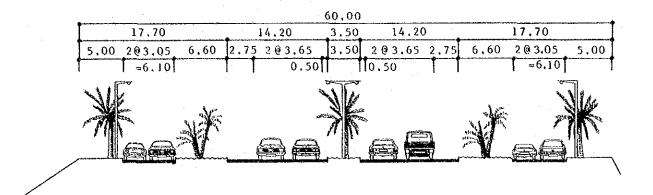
TYPICAL CROSS SECTION OF CORREDOR SUR (VIA CIUDAD RADIAL - PAN AMERICAN HIGHWAY, TOCUMEN)
